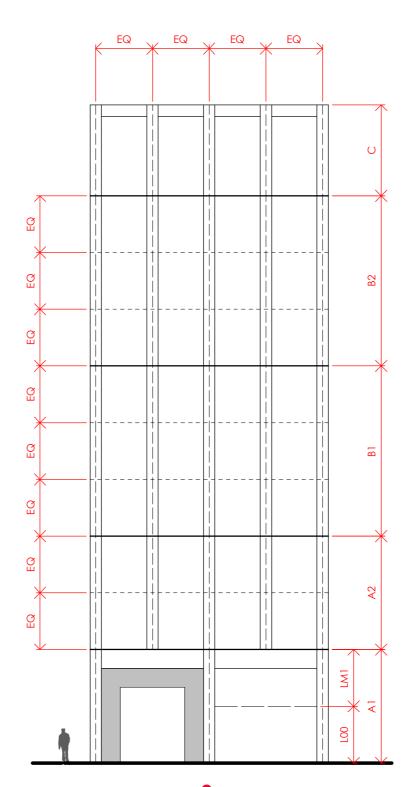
Plot 5.2 - 5.3 Facade Heirarchy
